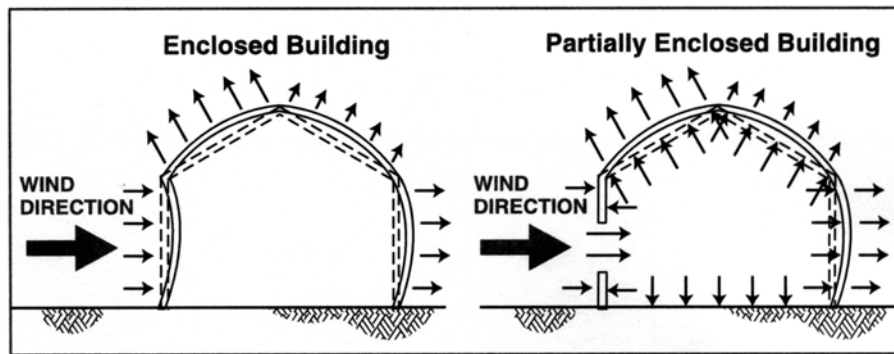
Enclosed buildings experience wind-induced pressure on the upwind walls and suction forces on the roof and lee walls. A partially enclosed building experiences increased loads due to the pressurization of the interior of the building. Reprinted with permission from the FEMA Coastal Construction Manual (FEMA, 2000).
